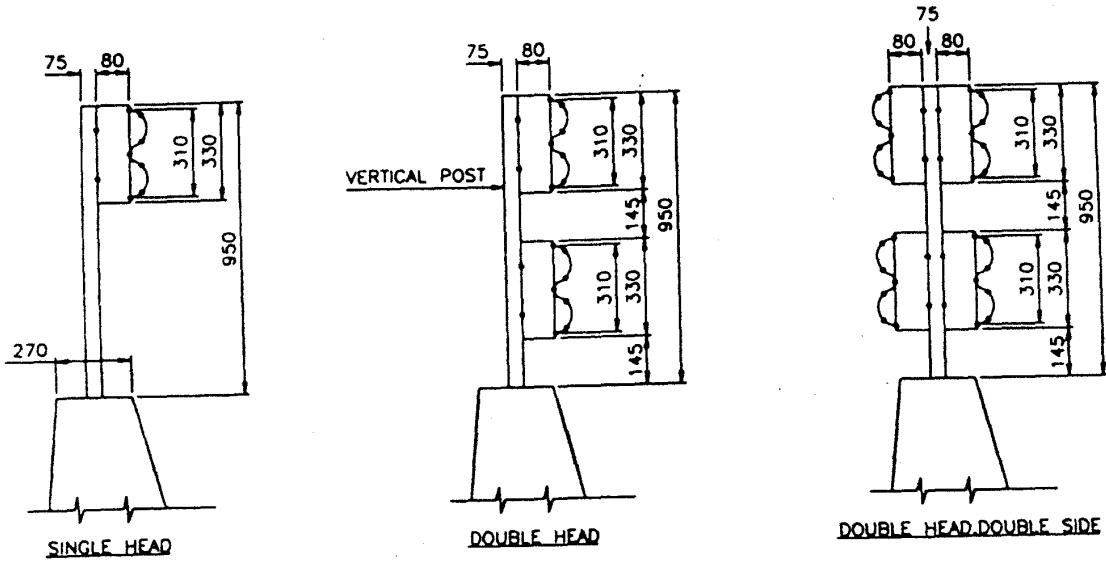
(b). Various Type of Crash Barriers (Clause 115.4.3)
